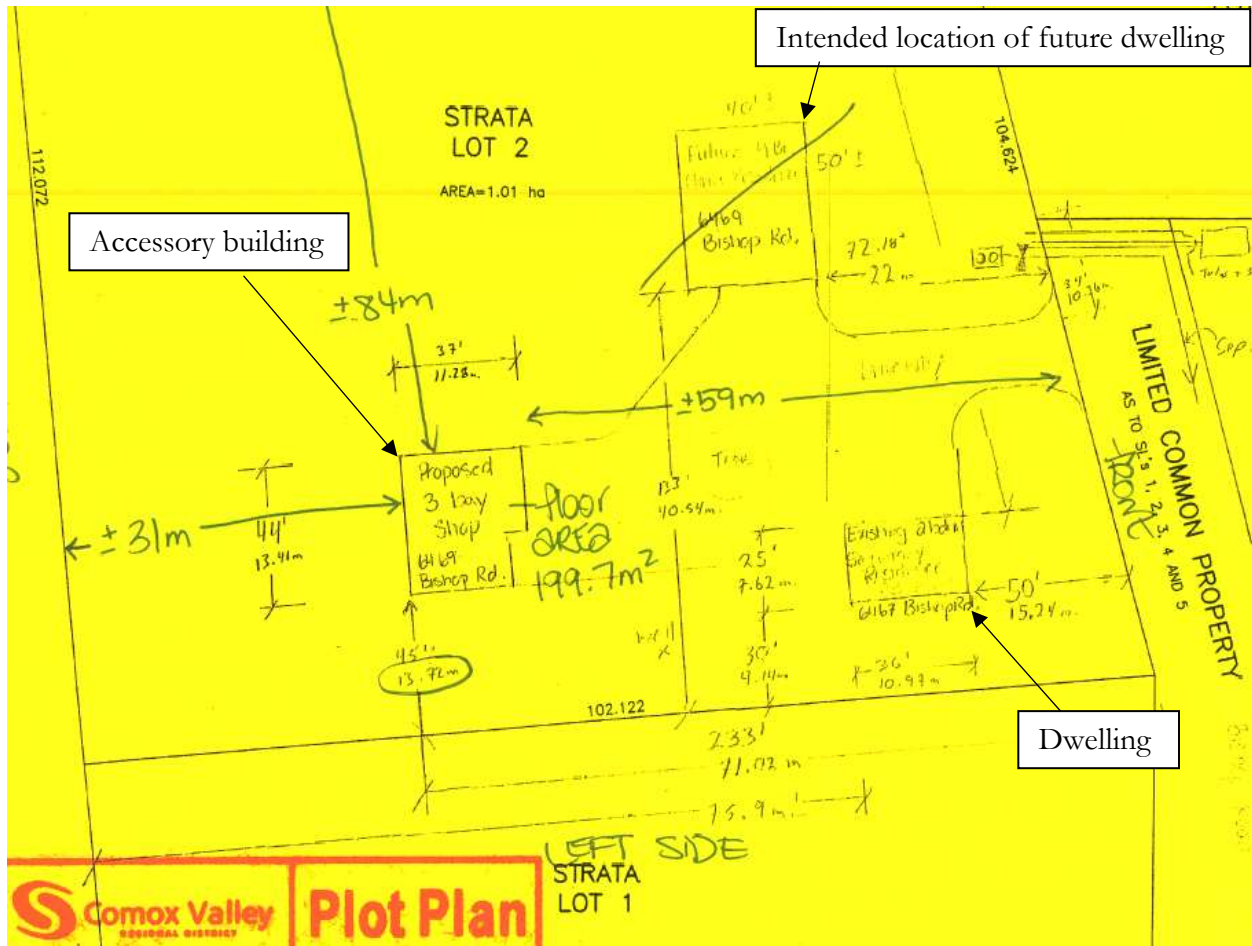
Site Plan that Illustrates Location of Accessory Building on Property
